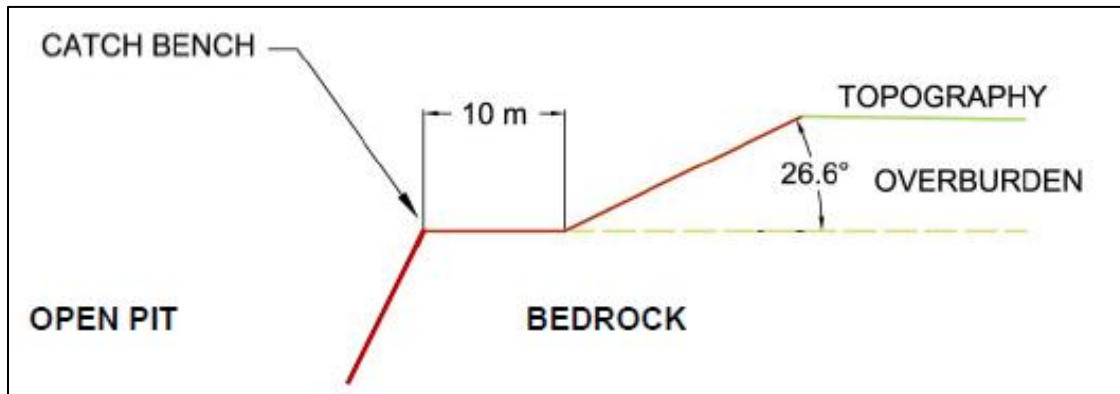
Wall Sections of Proposed Tony Block Pit Walls
